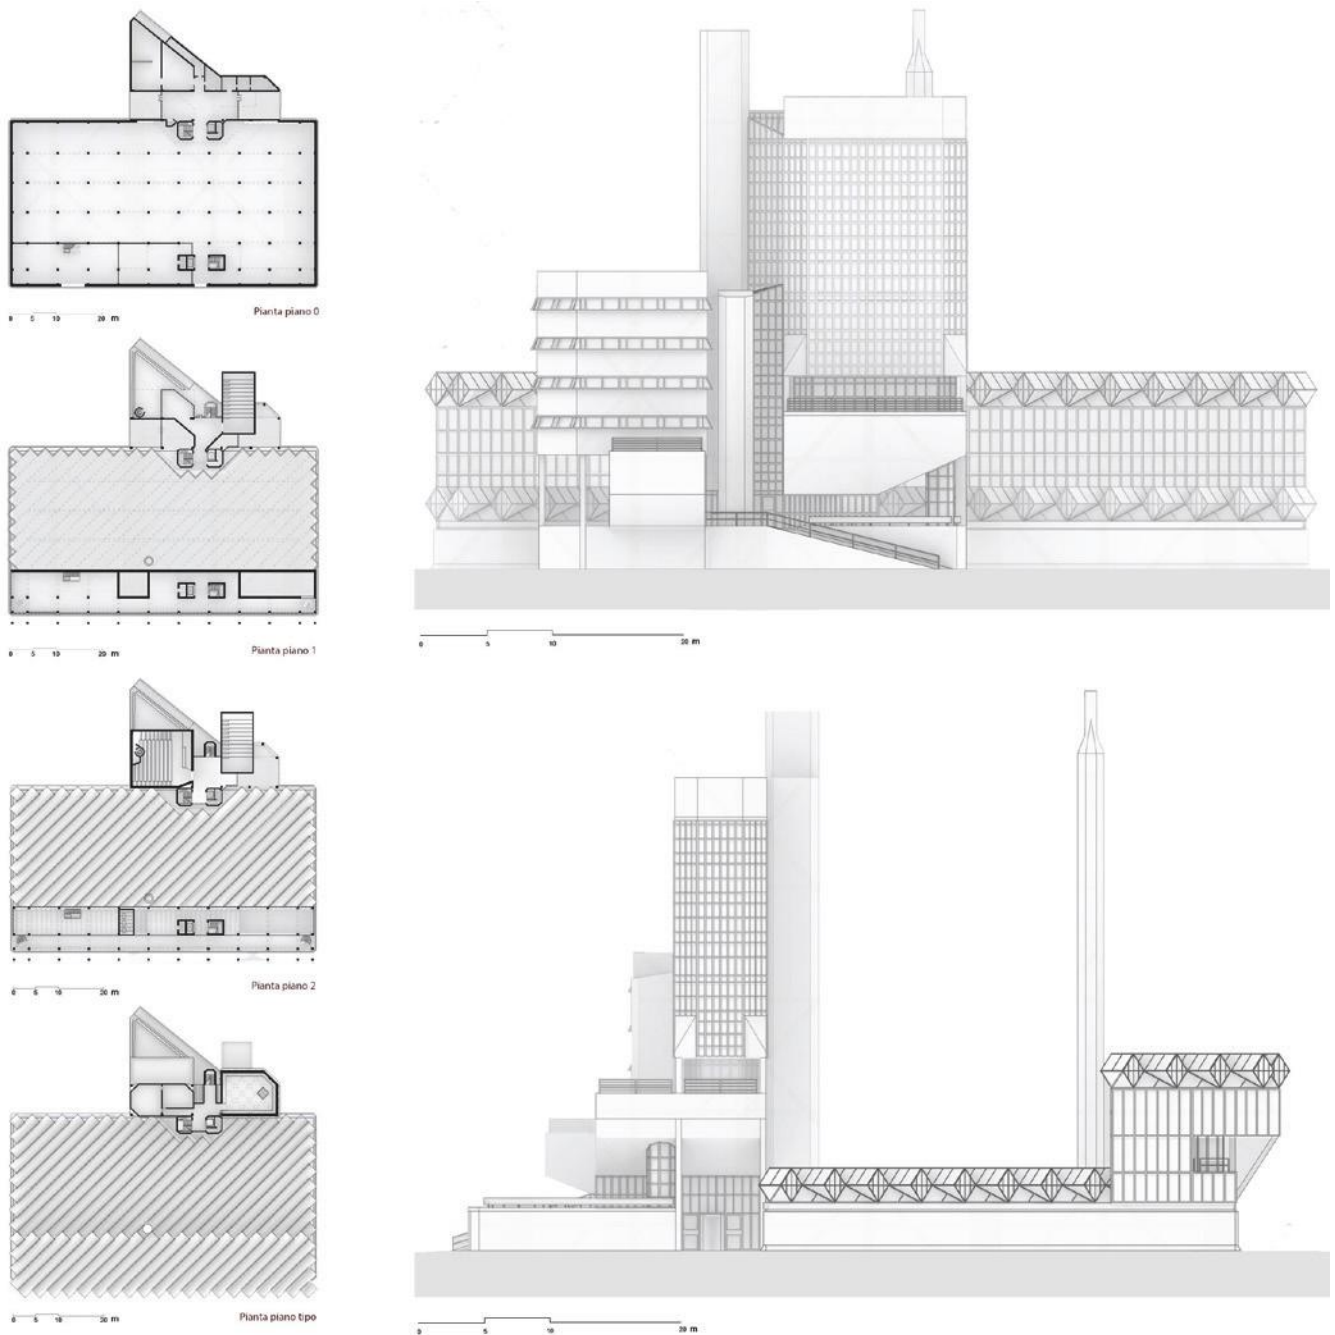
Plans and front views of the Leicester Engineering Department Building by Stirling e Gowan. Source: images created by the authors.
